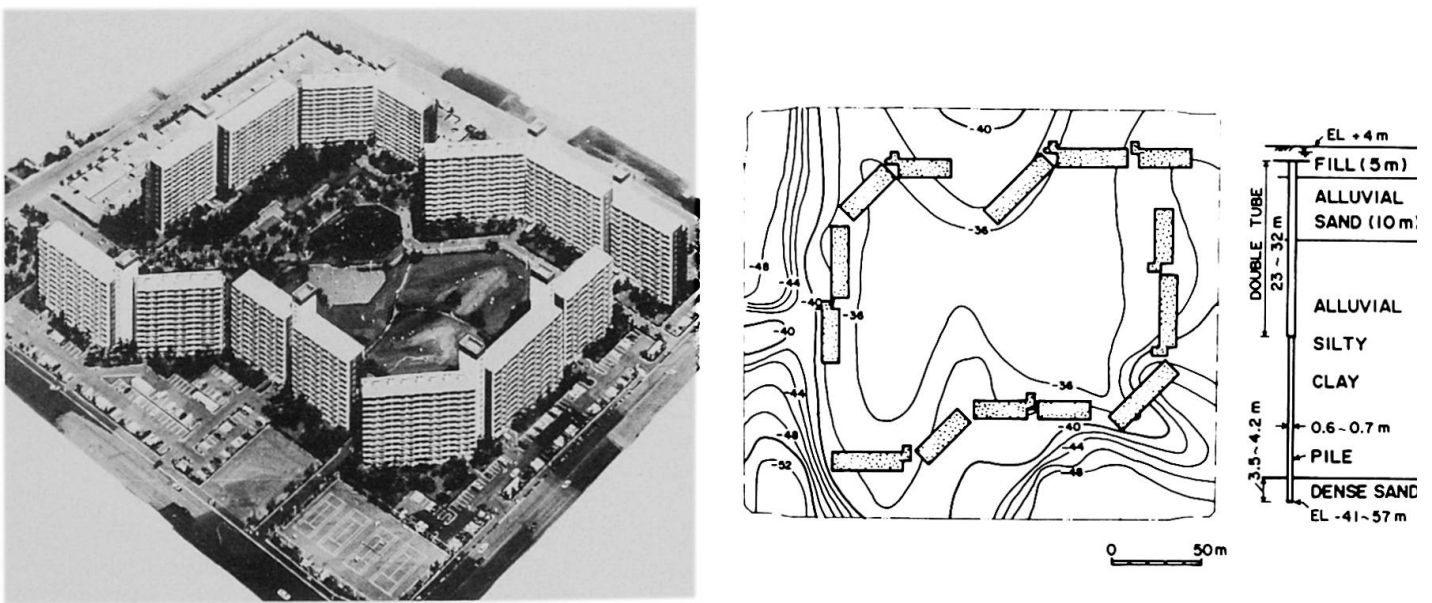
High-Rise Residential Buildings in Urayasu, Japan. (Numbers along contours show elevations of dense sand supporting point-bearing piles. Photo courtesy of Oriental Land Co., Ltd.)
